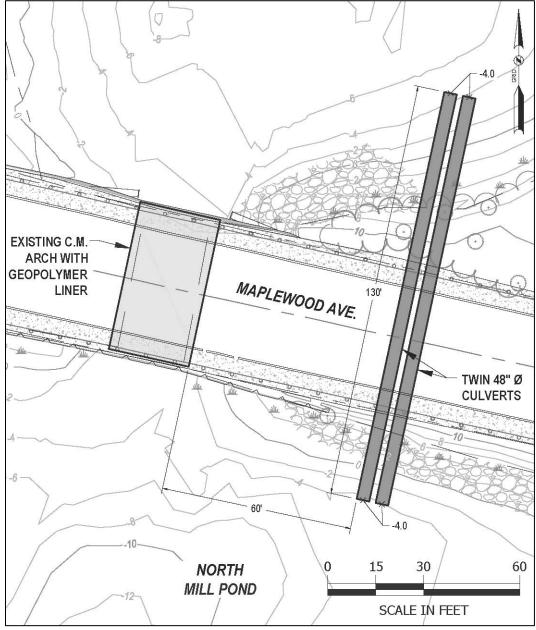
Bridge Rehabilitation Alternative 2.1 schematic plan
